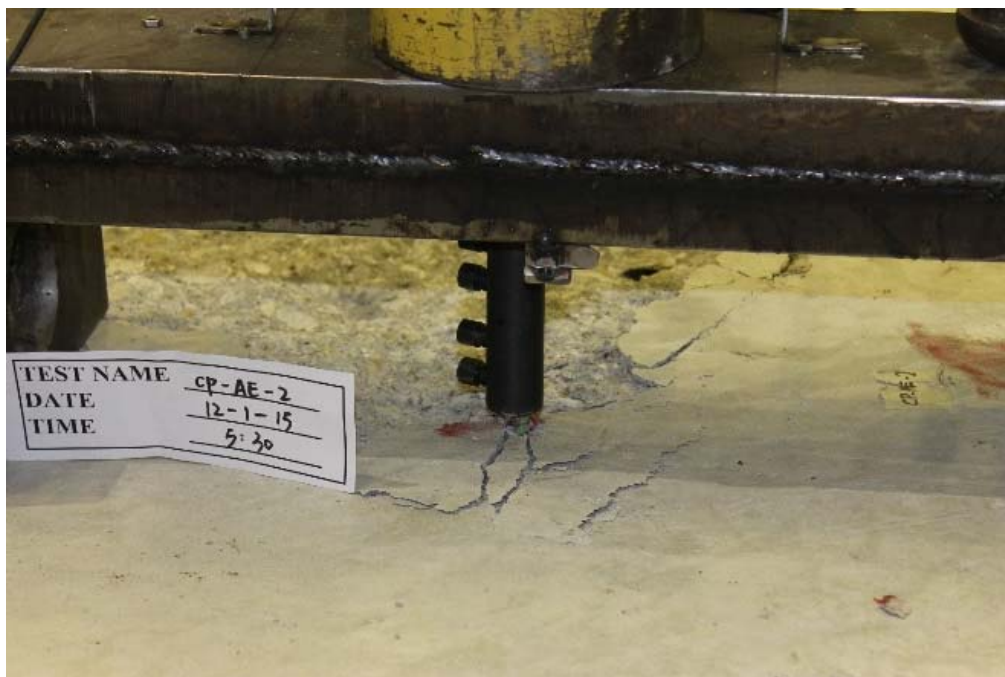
Detailed view of the reinforcement at failure for CP-AE-2
